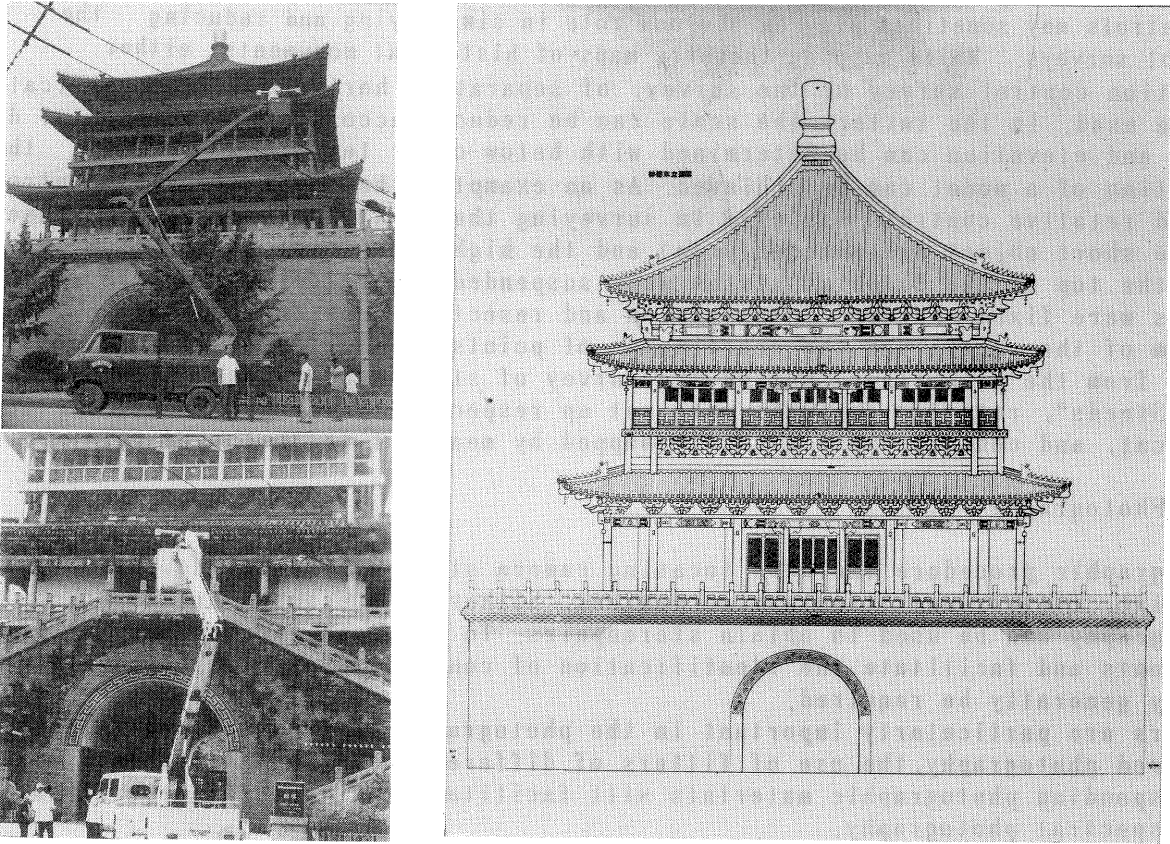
Architectural photogrammetric survey of Xi'an Bell Tower. Left: the operating site. Right: the east elevation of the Bell Tower. Scale: 1:50.
